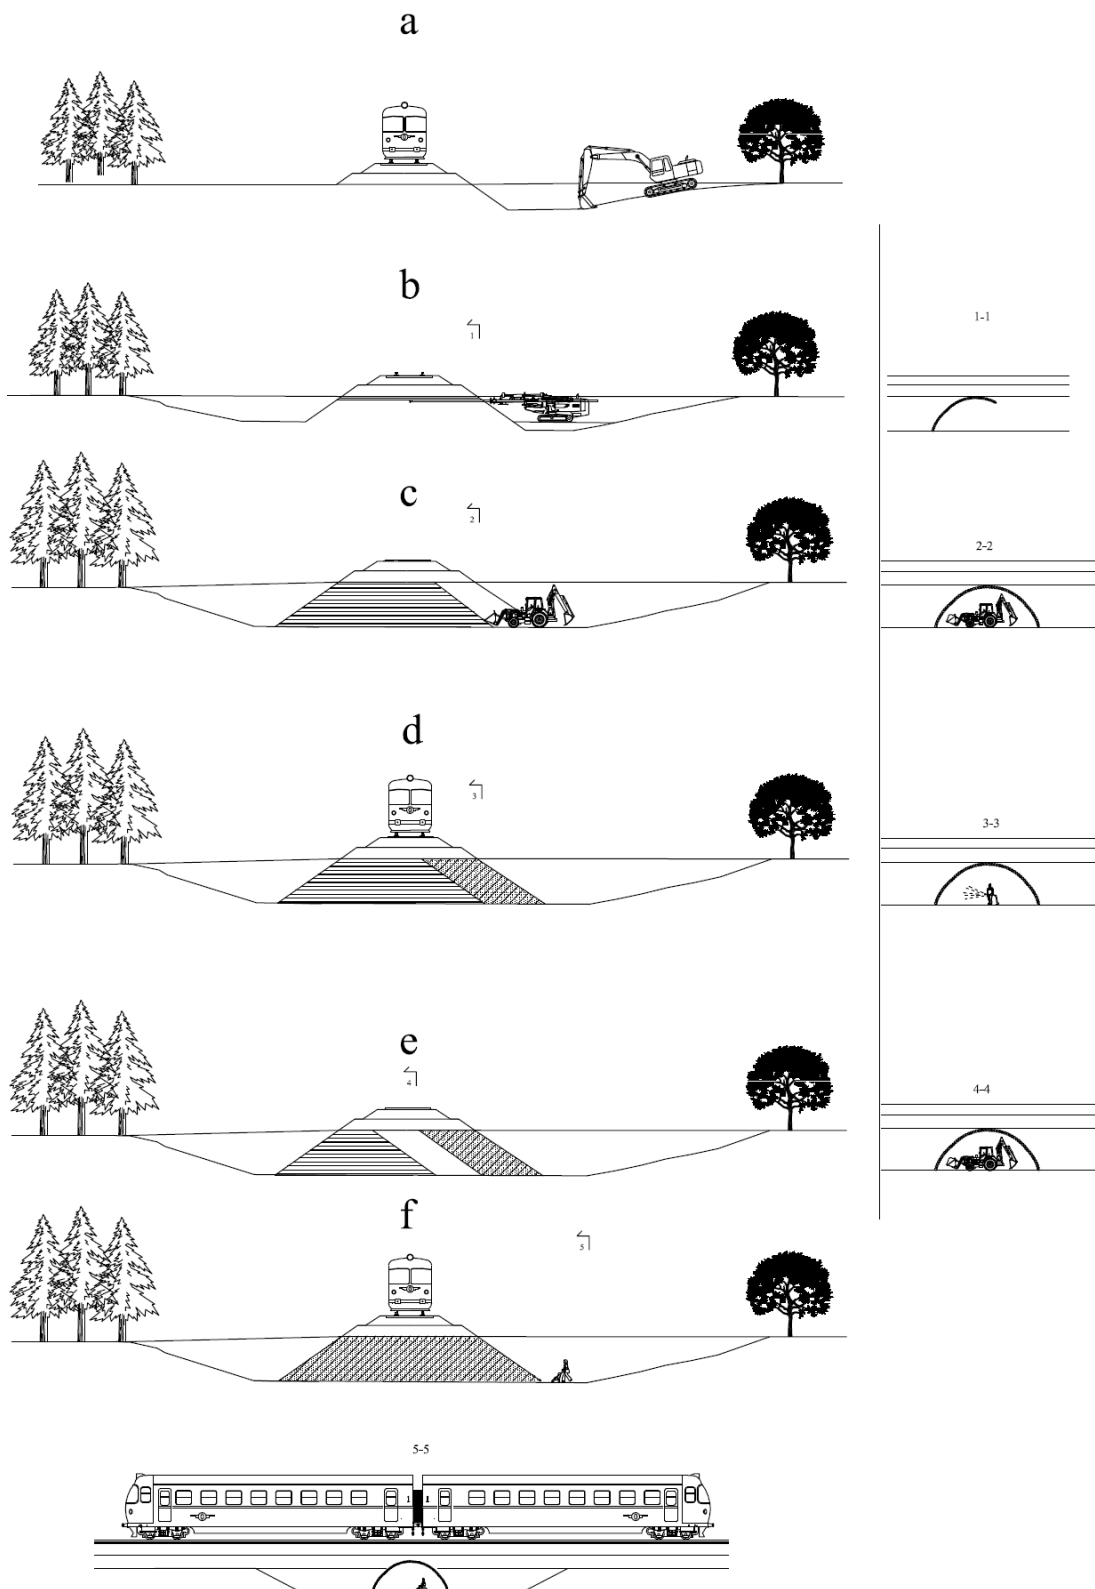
A tunnel is proposed to pass through an embankment with horizontal drilling. The arch is drilled using CT profiles and the roof is shotcreted after excavation. (Laakso & Hautamäki 2014)
